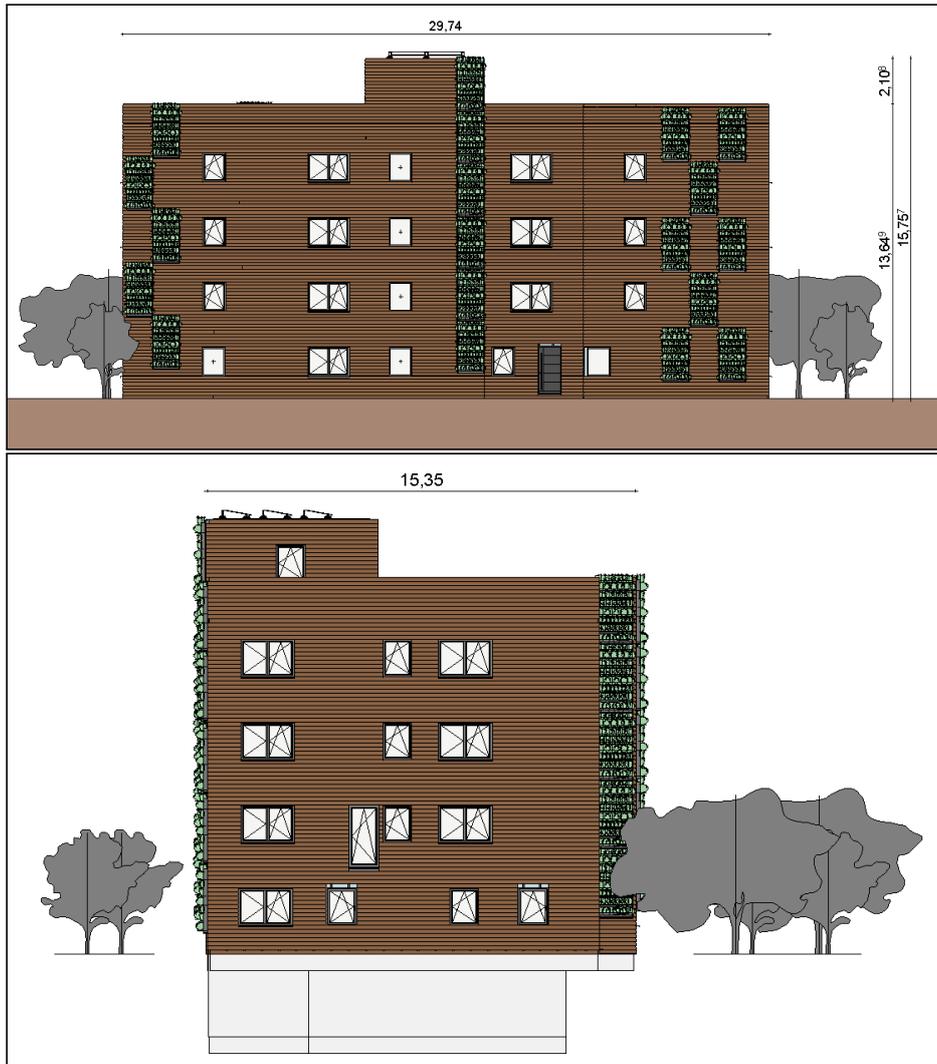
Side views of the practice-oriented building example (screenshot in *Revit*)
